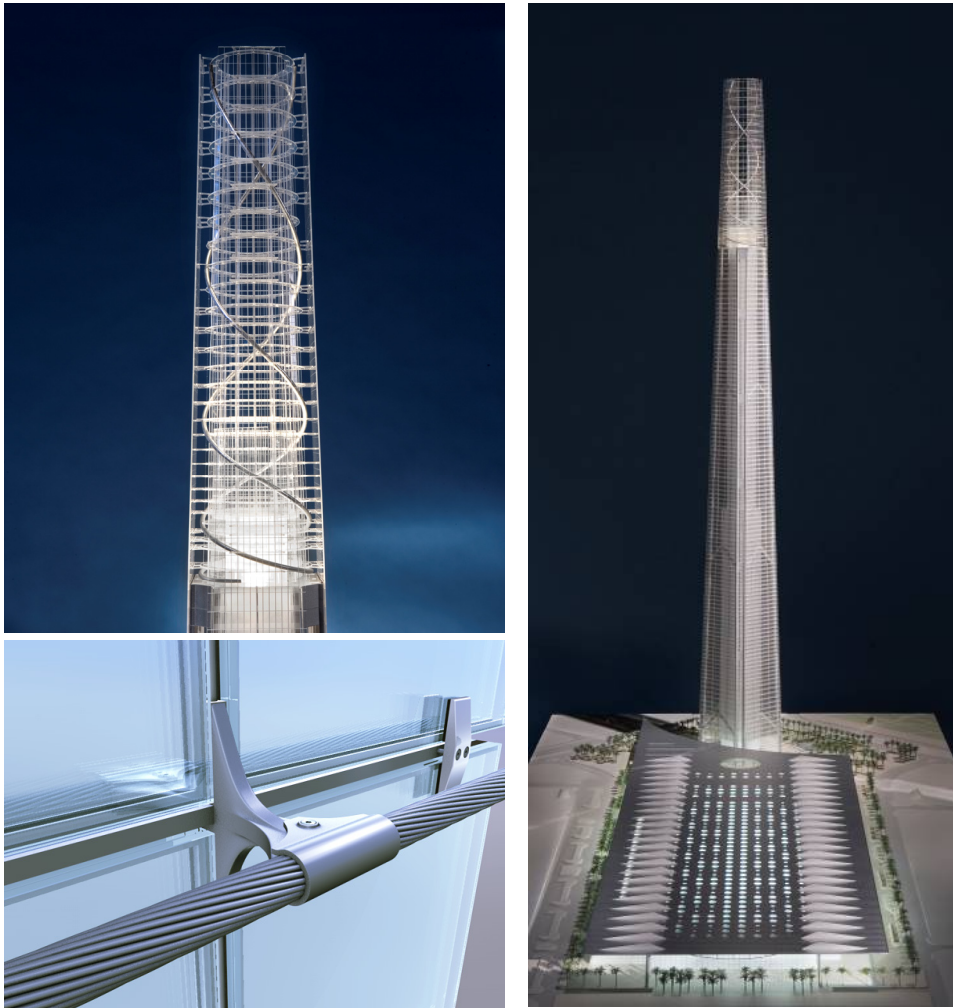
Doha Convention Center and Tower, Qatar – Special Façades.
